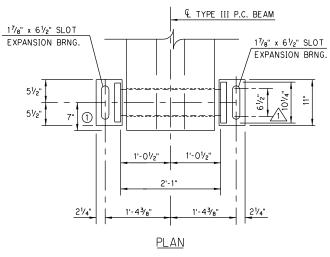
DETAILS OF BEARING ASSEMBLY AT ABUTMENTS
